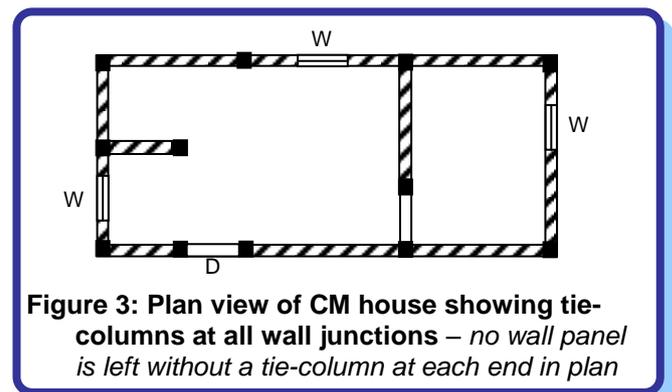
Plan view of CM house showing tie-columns at all wall junctions – no wall panel is left without a tie-column at each end in plan
